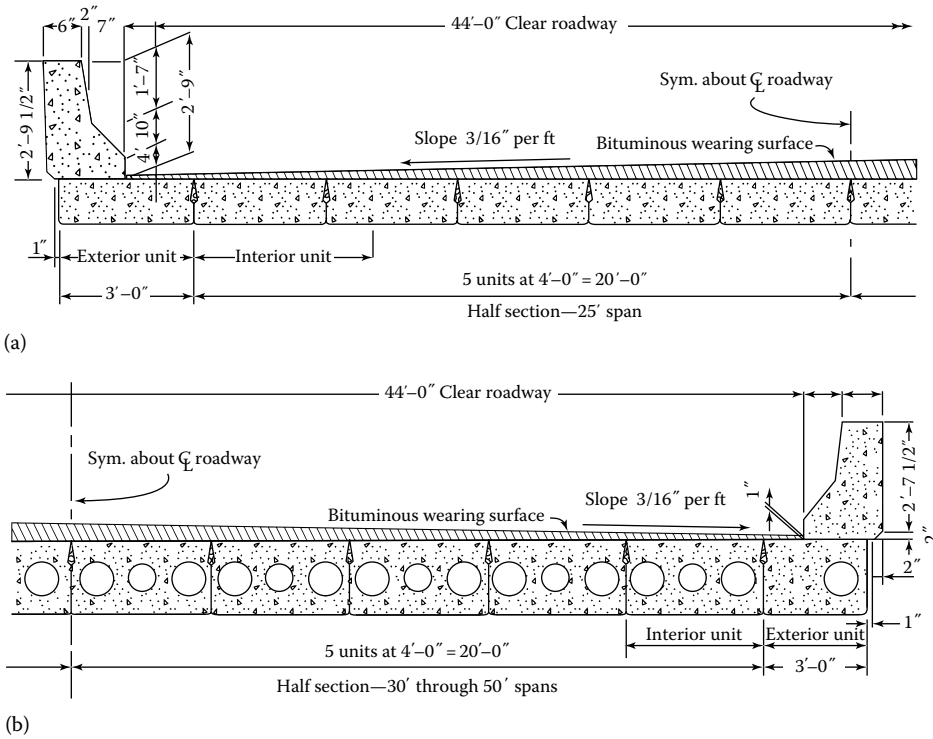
Superstructure system Type *f*: adjacent prestressed concrete box girders: (a) adjacent solid box girders and (b) adjacent voided box girders. (Note: dimensions shown are for illustrative purposes only; cross-sectional dimensions may vary depending on the number of design lanes.)
